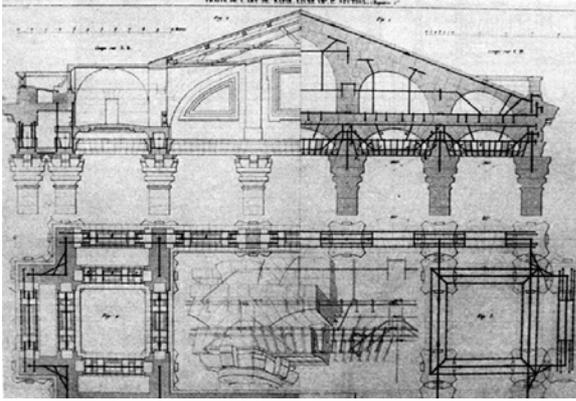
Eglise de Sainte-Geneviève, Paris, Jacques-Germain Soufflot and Jean-Baptiste Rondelet, 1770. Illustration shows wrought-iron reinforcement of masonry. (Steiner)
